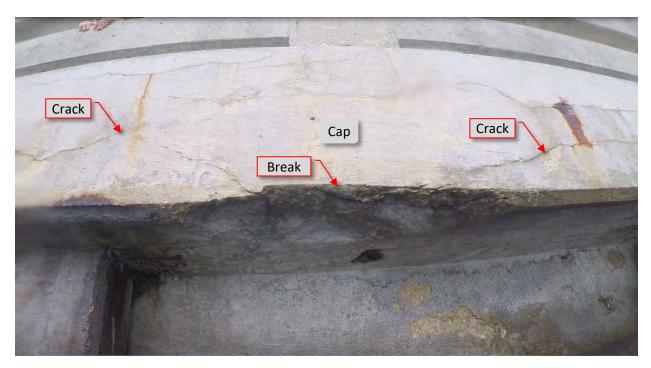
C14. STA 6+22 - 6+40. Crack at cap's vertical face and break of concrete at cap's bottom edge.
